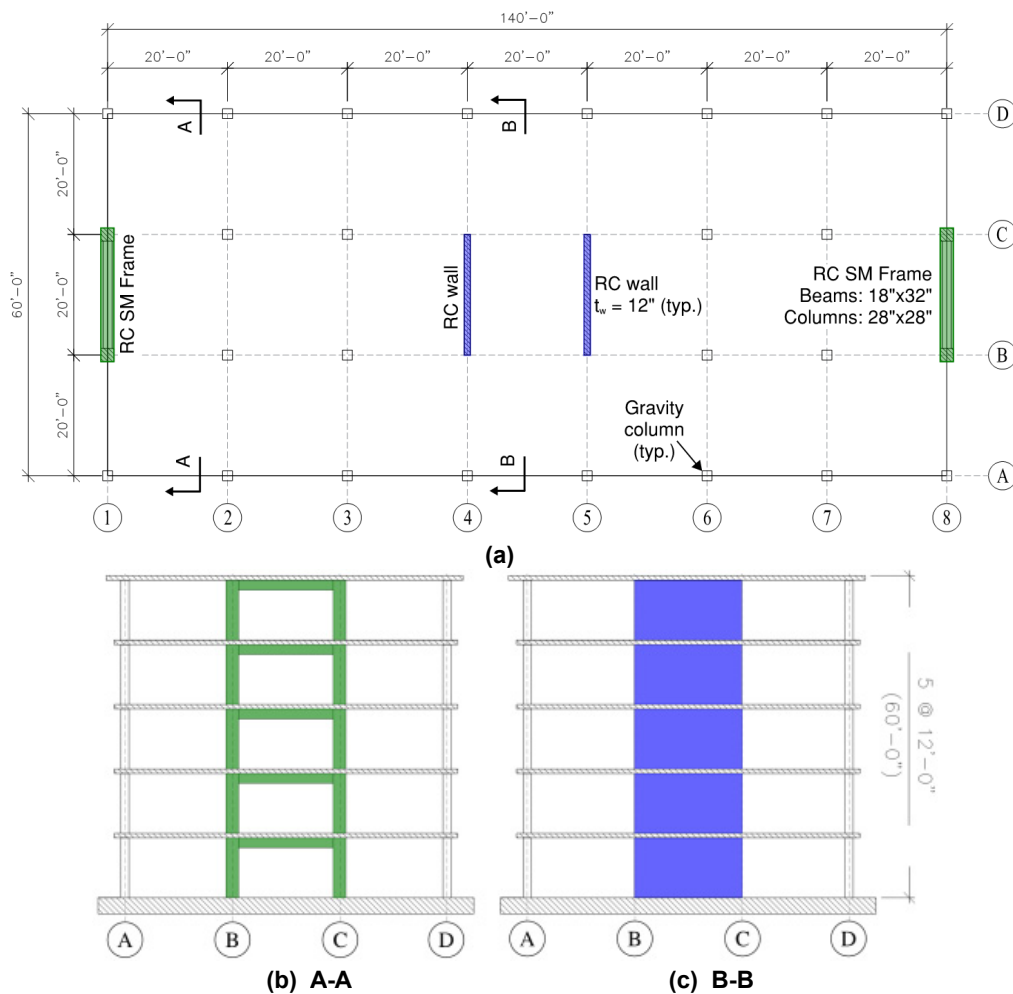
Building views: (a) plan view; (b) frame elevation; and (c) wall elevation.
